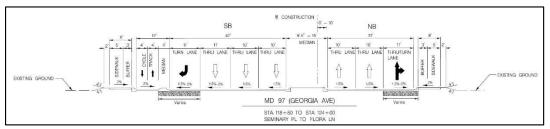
Proposed Typical Cross Section – Seminary Place to Flora Lane
